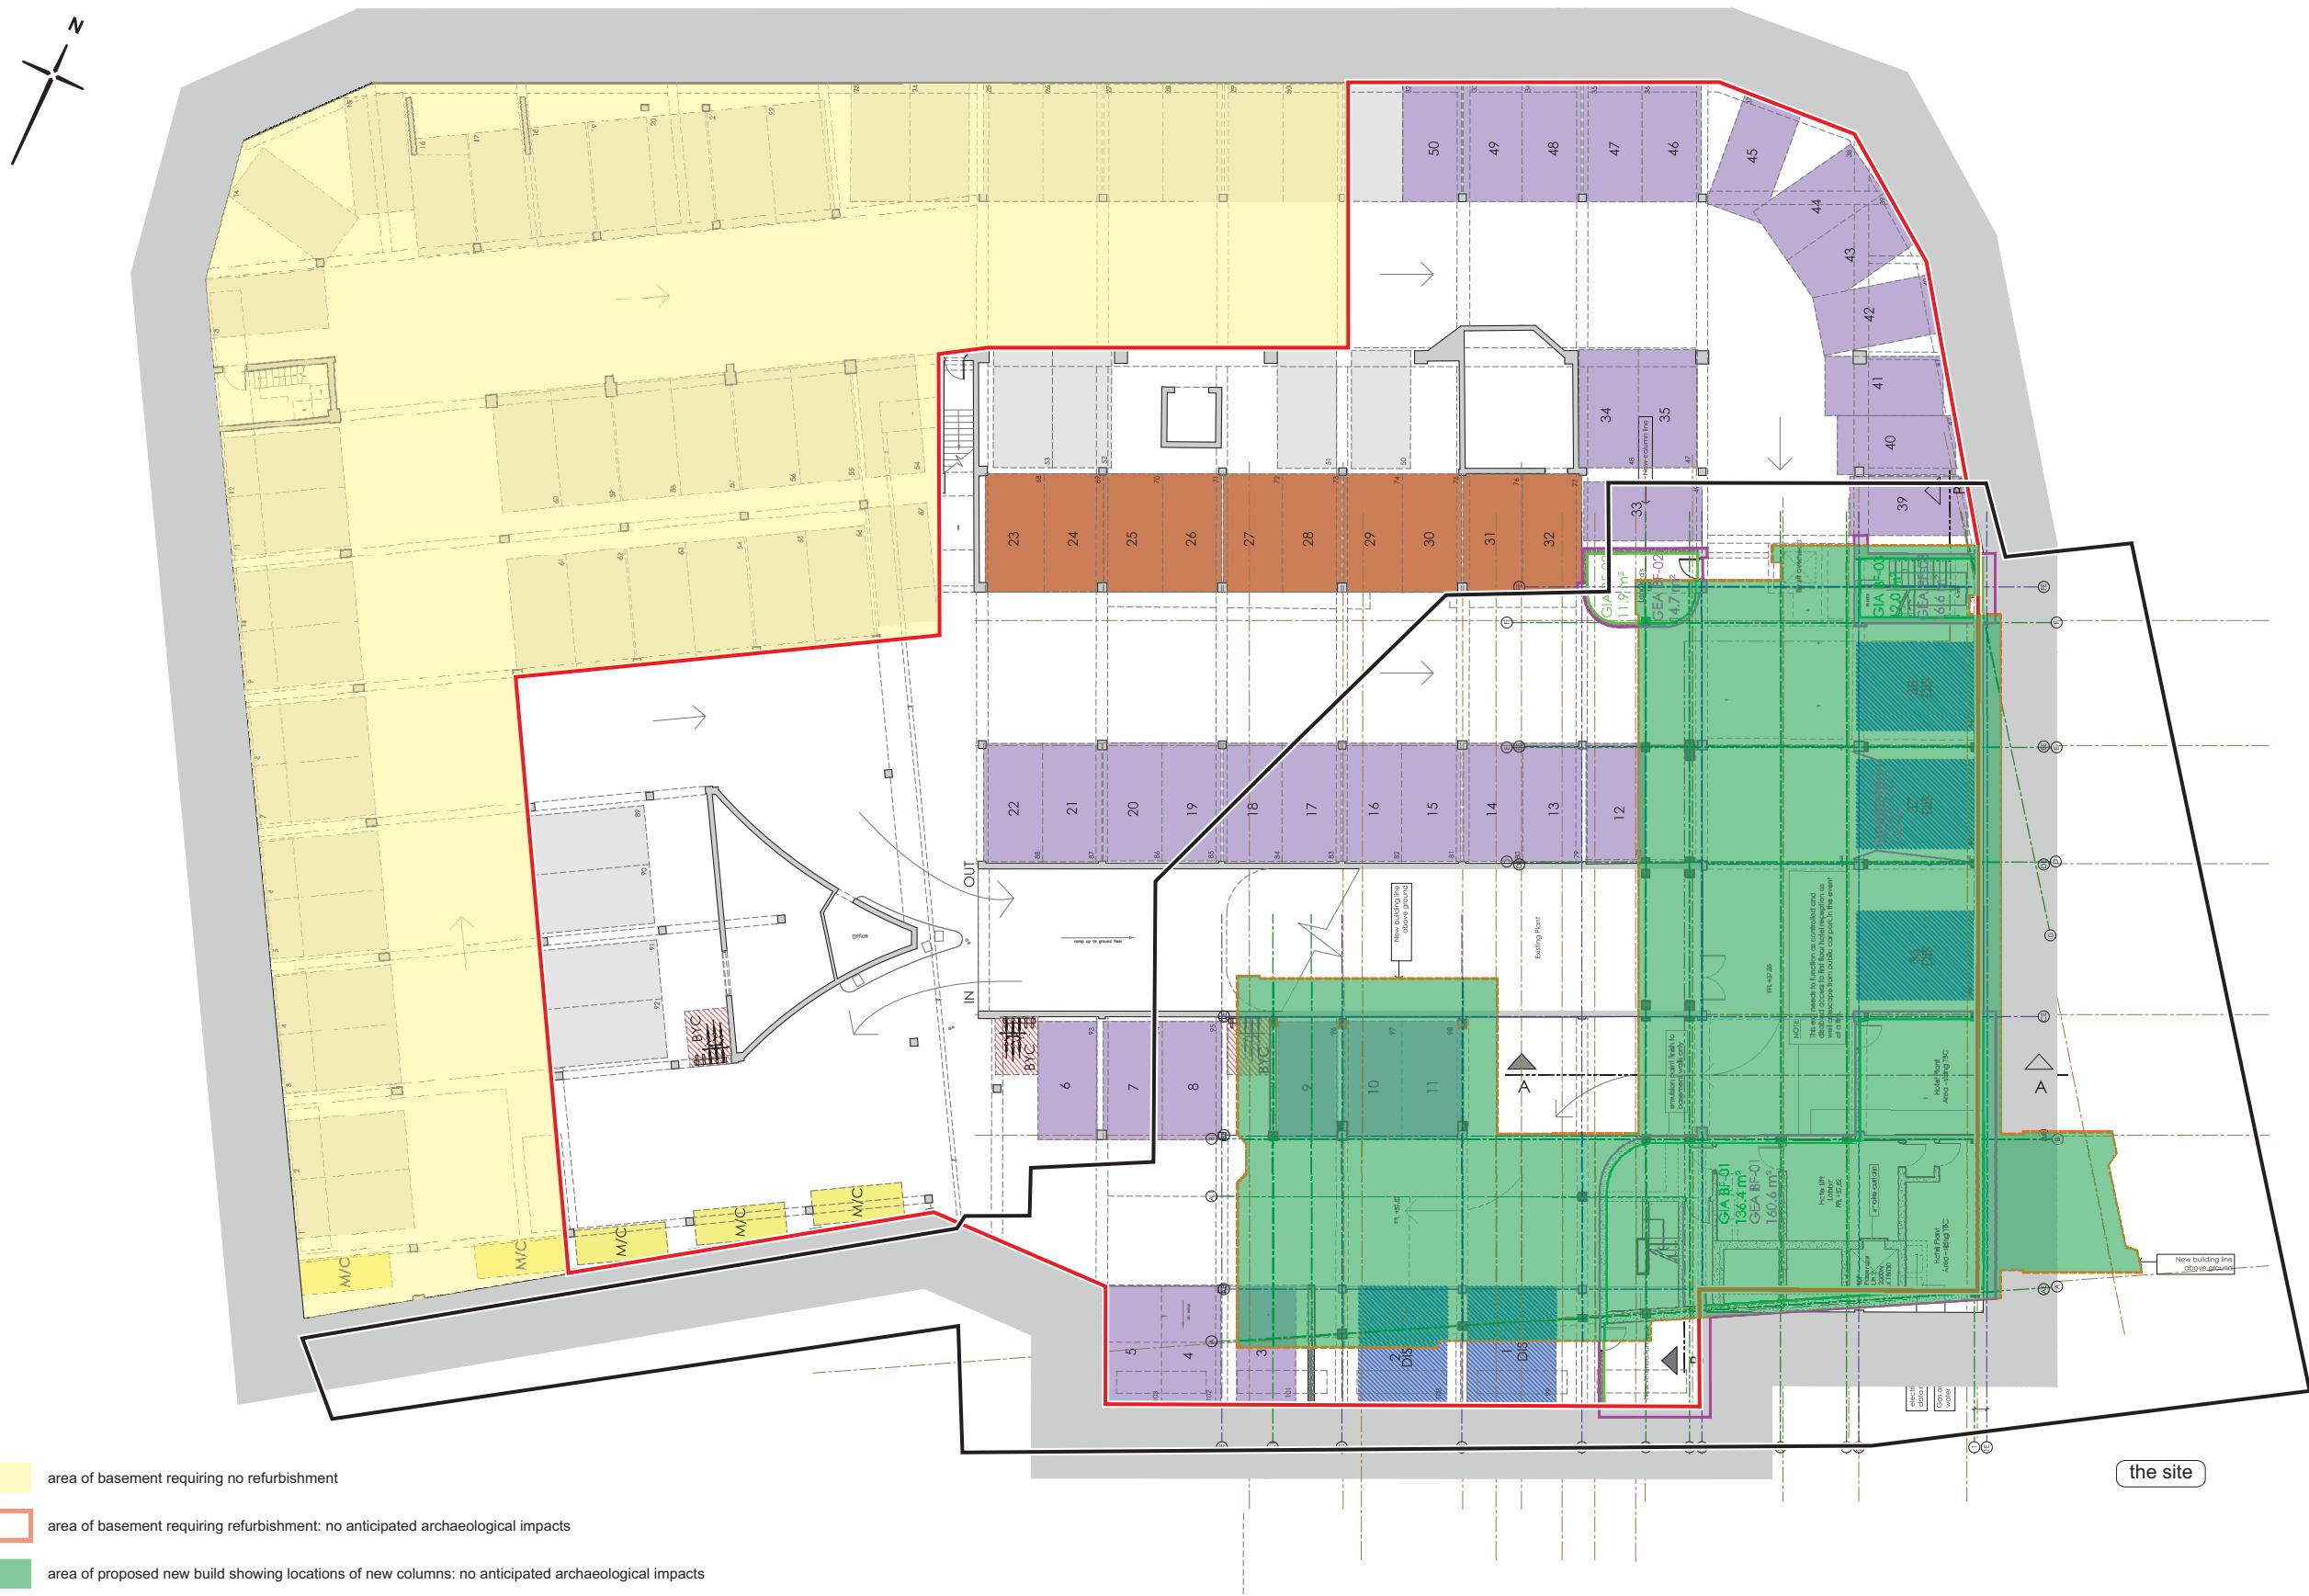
Ground floor foundation plan showing location of new column foundations pads (jpp, Drawing No. SK002, Rev. P1, 21/08/2018)Basment floor plan showing all areas of refurbishment, including locations of new columns (Gaunt Francis architects, drawing no 12024/PL-P 098, Rev D, 24/10/2018)
